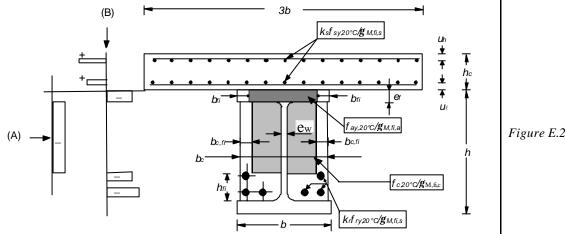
Stress distribution in concrete (A) and steel (B) for hogging moment
